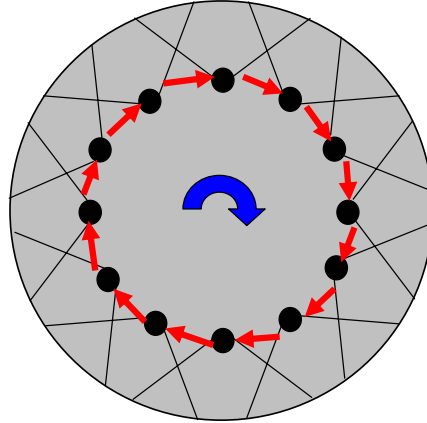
Concrete breakout of an anchor caused by shear directed parallel to the edge for a circular foundation
